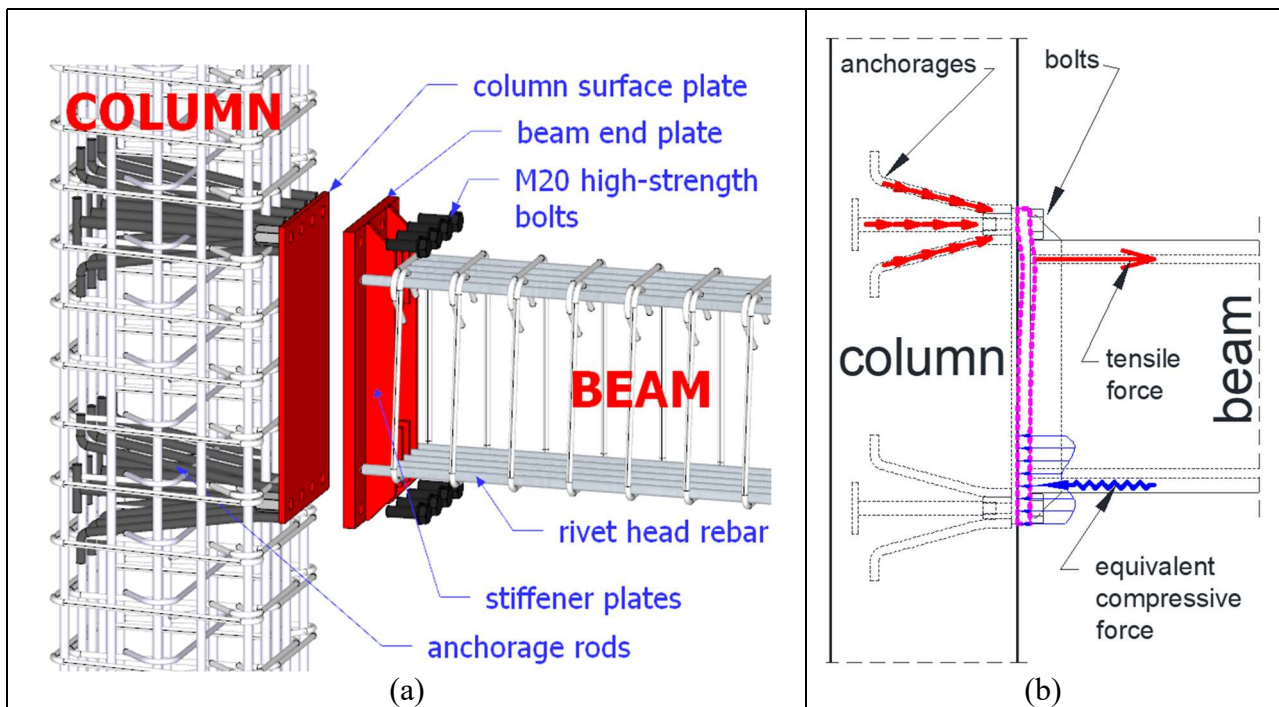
General concept of the proposed connection system; (a) Geometry of beam to column connection; (b) General load transfer mechanism
